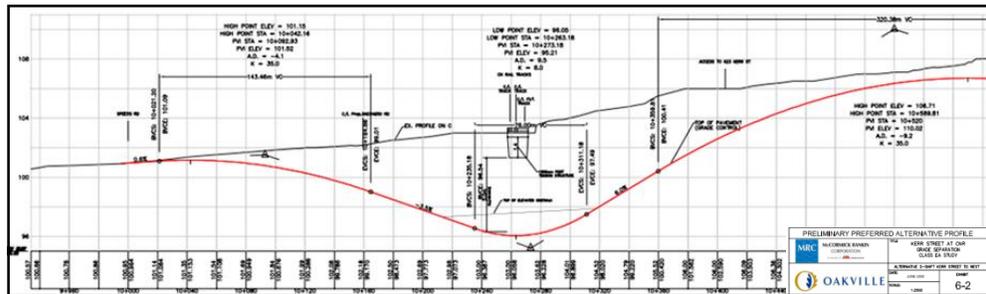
Section Illustrating Changes to Grade along Kerr Street
